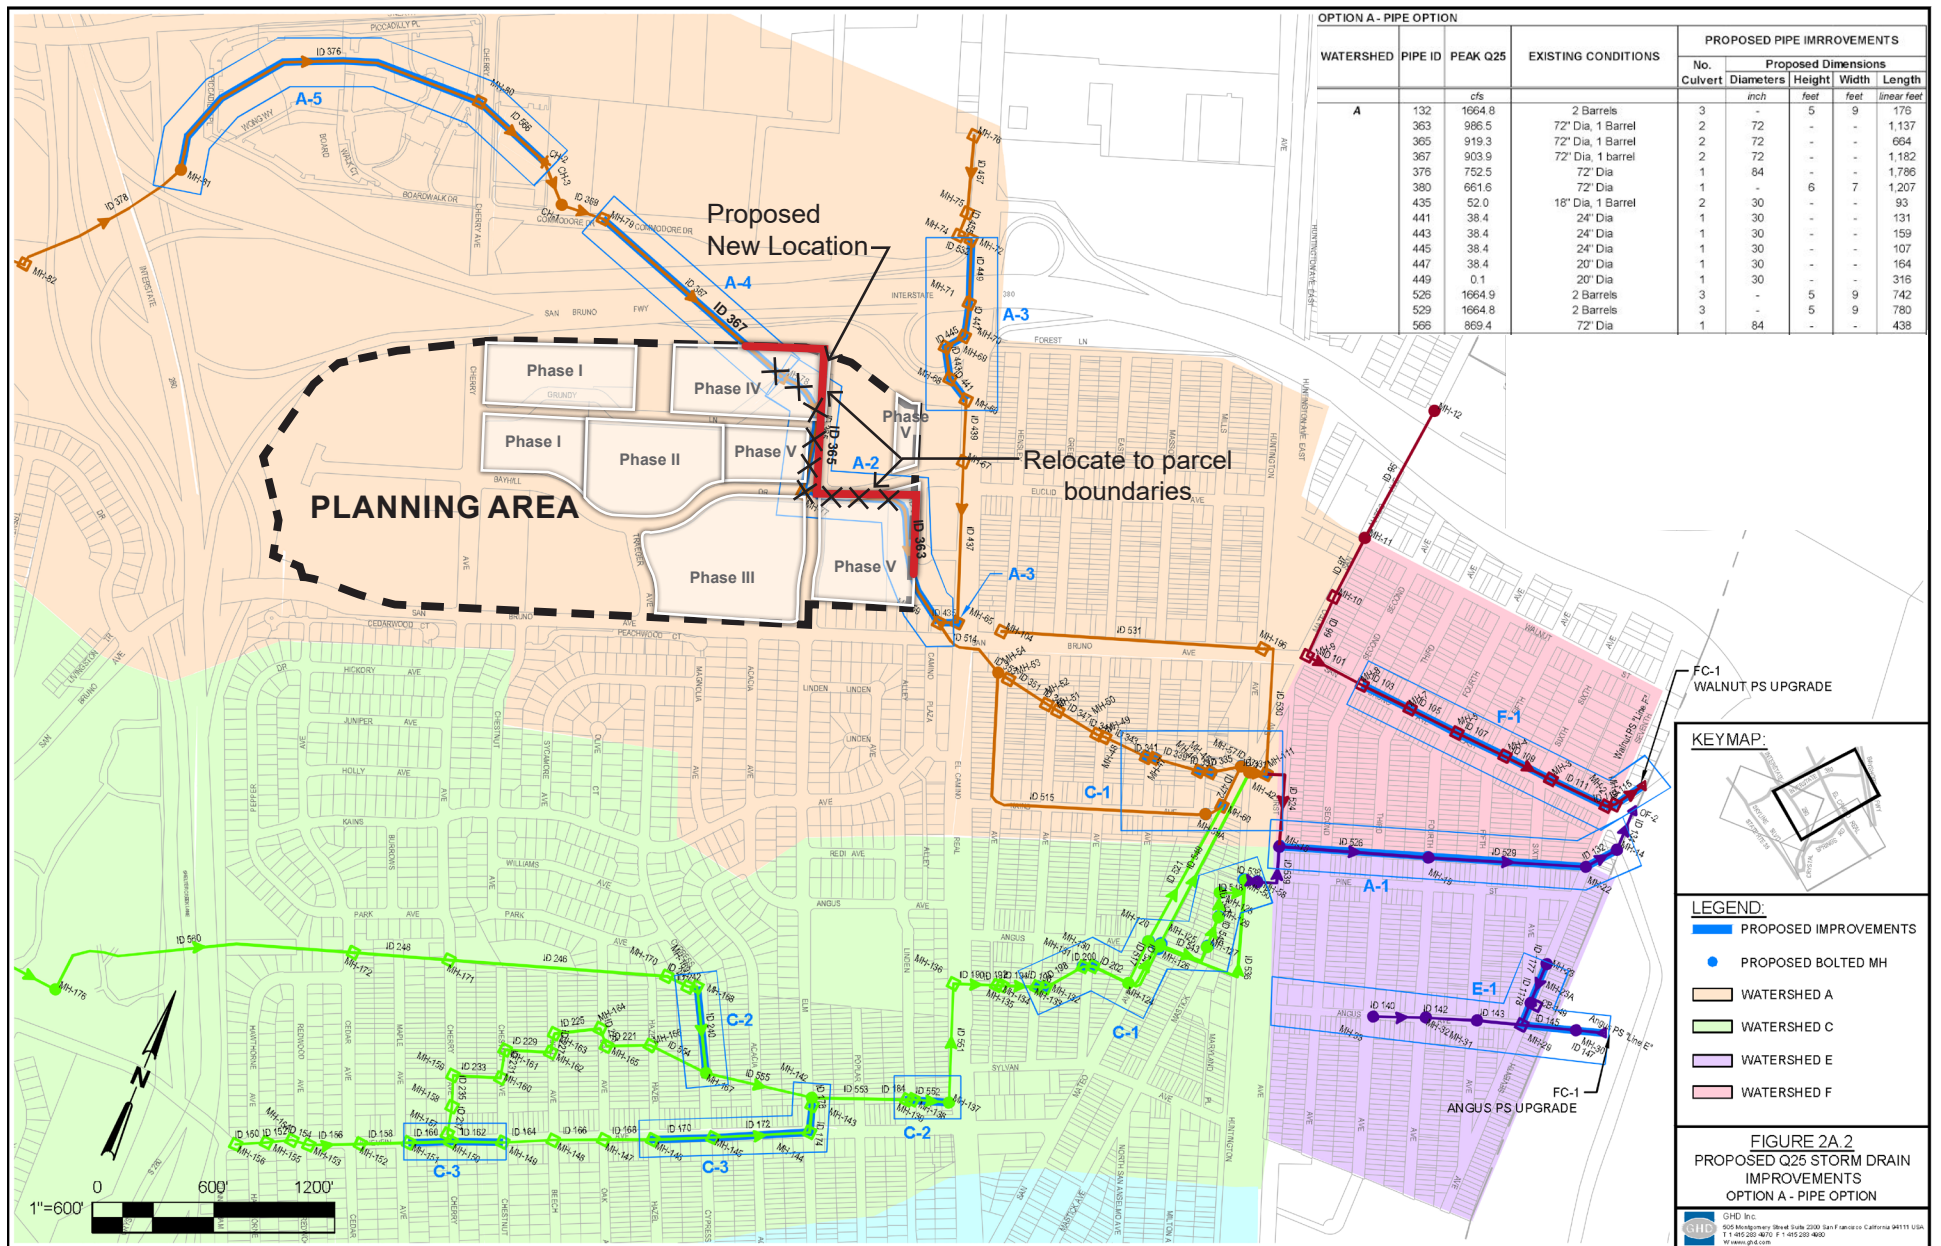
Storm Drain Master Plan Proposed Improvements (Pipe Option)
